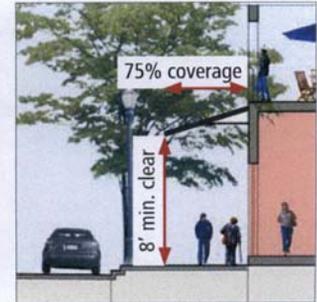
Awning section with minimum clear height above sidewalk & desired coverage.
